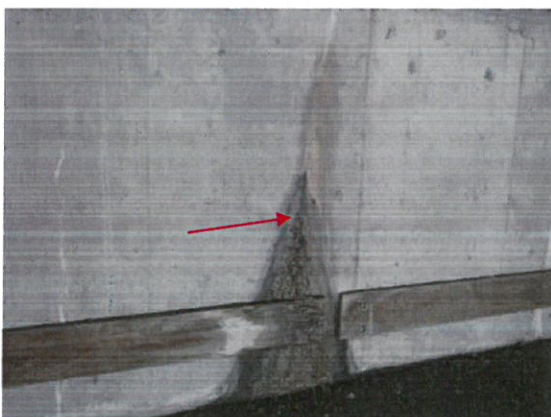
Water infiltration through west retaining wall on Parking Structure B
